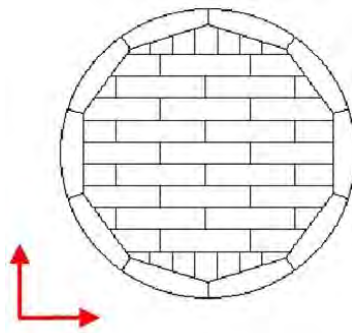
Position of tank datum into the bottom left-hand corner
